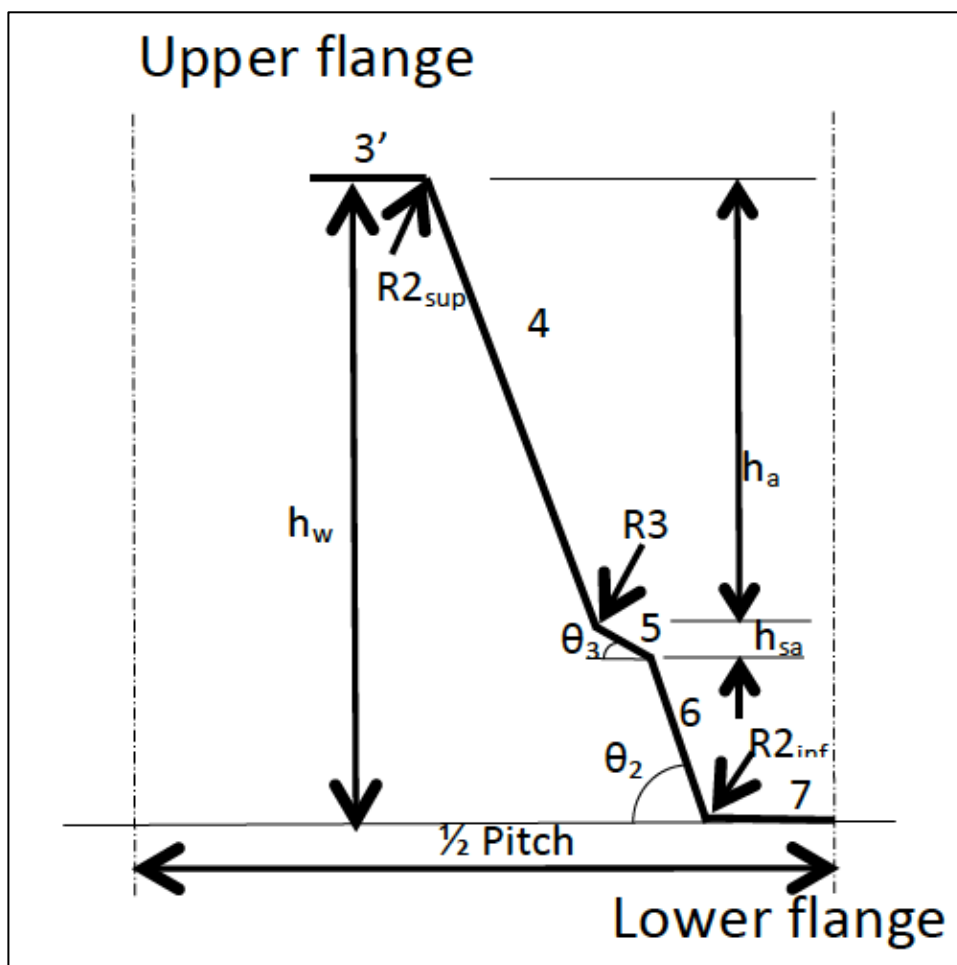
Steel sheeting with a hole in the flange, one stiffener in the other flanges and one stiffener in the webs.
